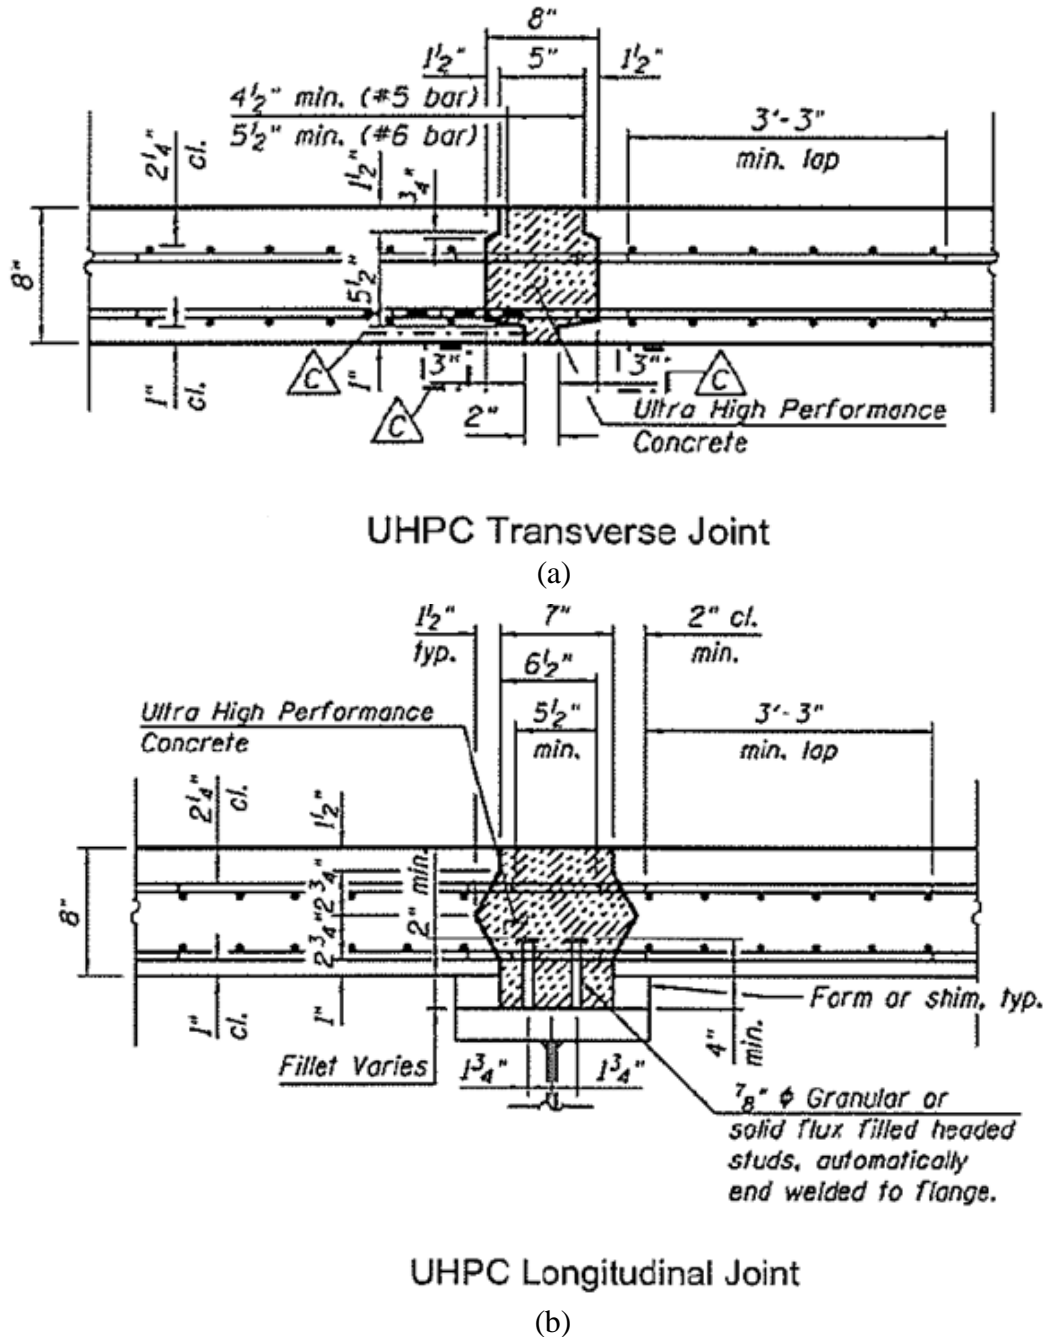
Typical FDPC deck panel detail for Illinois: (a) UHPC transverse detail and (b) UHPC longitudinal joint
